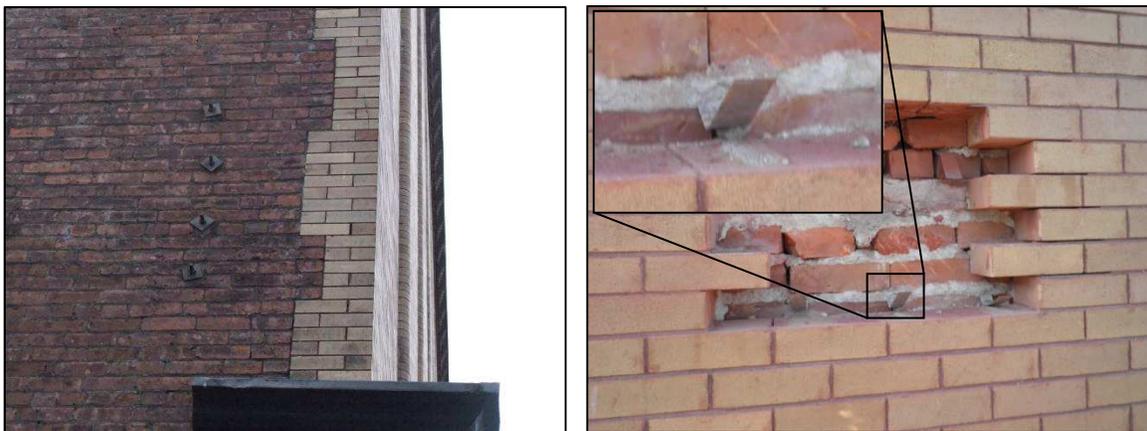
URM Building with a Veneer Wythe (Left) and Veneer Ties (Right)
